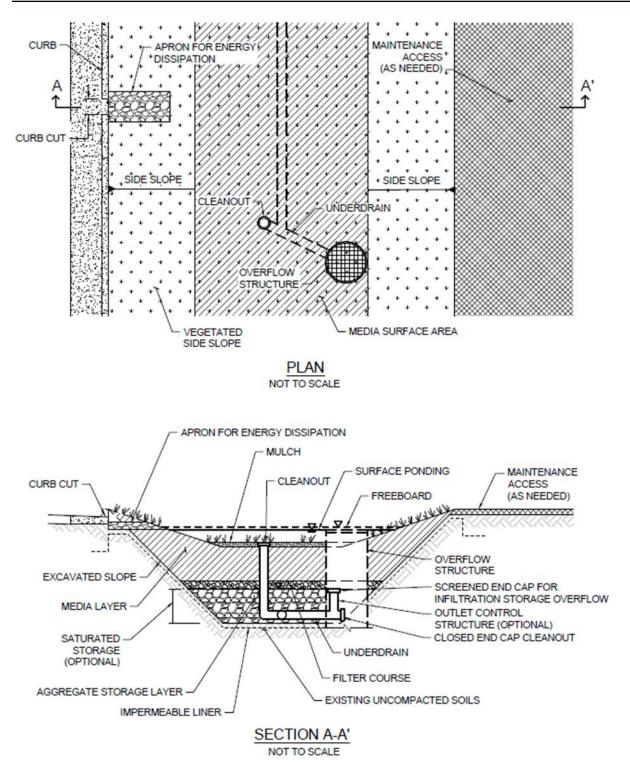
Typical Plan and Section View of a Biofiltration BMP
